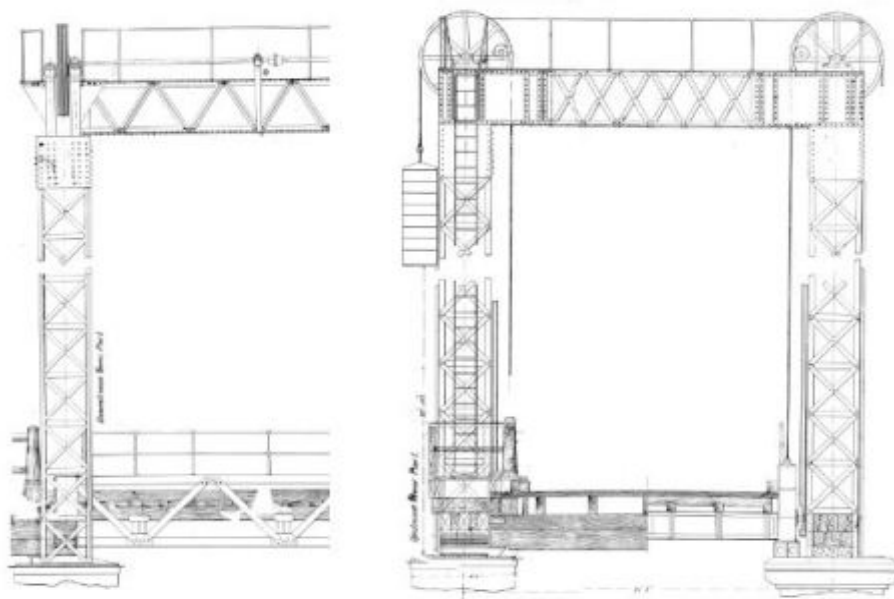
Drawing of lattice towers, transverse and longitudinal girders on Swan Hill Bridge
